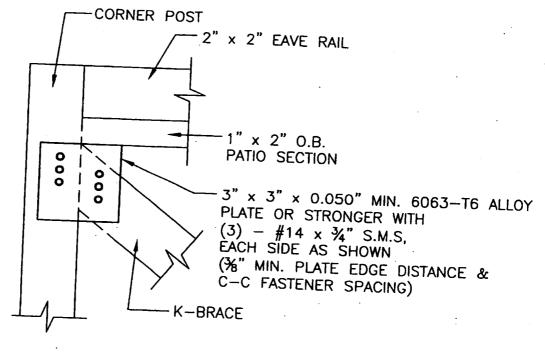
TYP. GIRT TO POST CONNECTION
